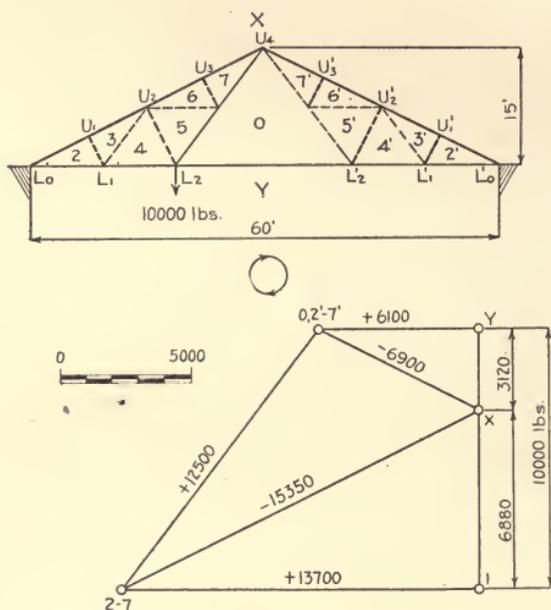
Pink Truss Loaded with 5-Ton Hoist; also Stress Diagram of Same.
